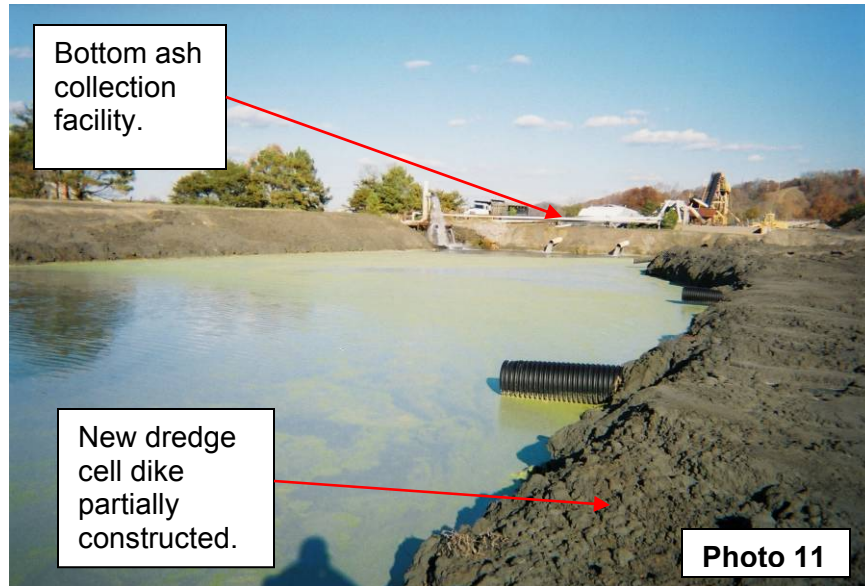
Bottom Ash Pond. New Dredge Cell Dike Construction.
